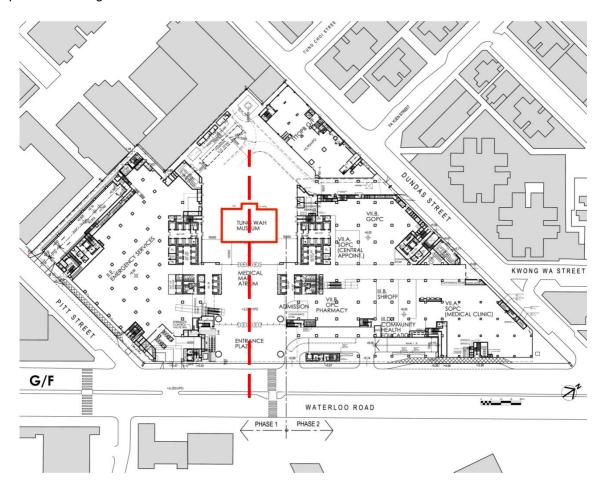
Ground Floor Plan of Latest Proposed Scheme
